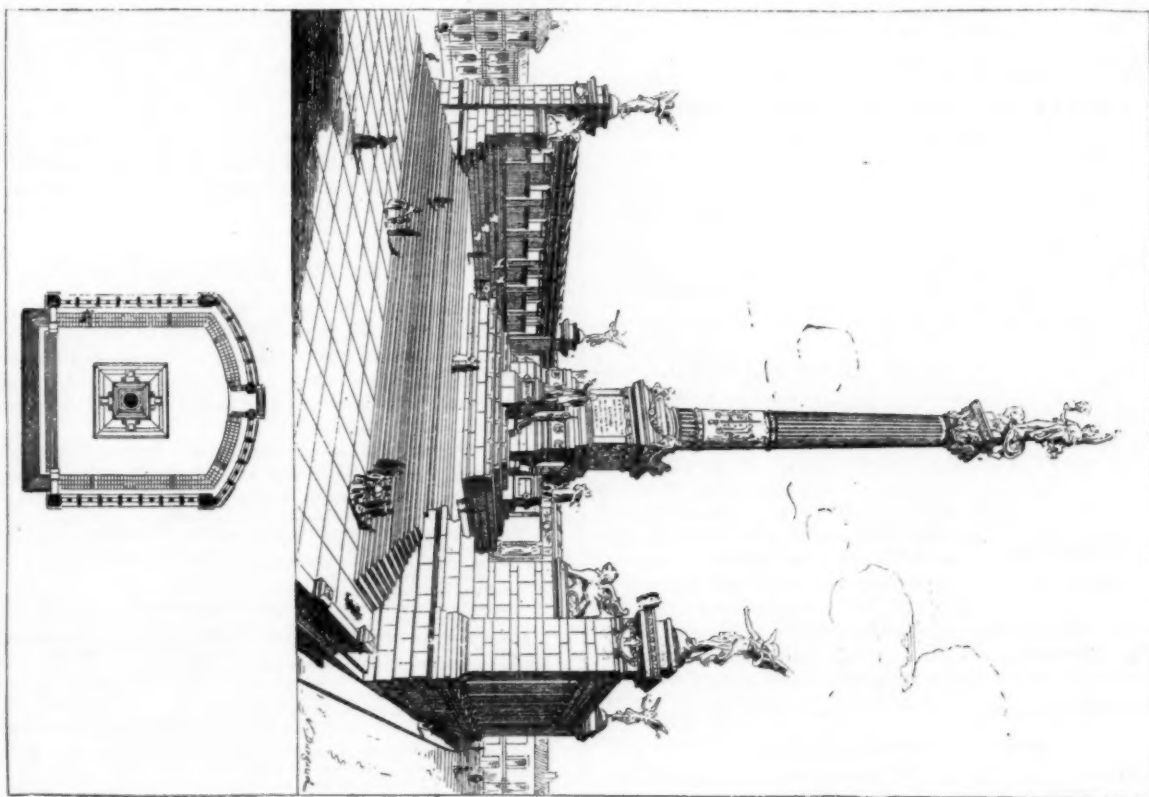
Design for a Monument to commemorate the Constituent Assembly.
